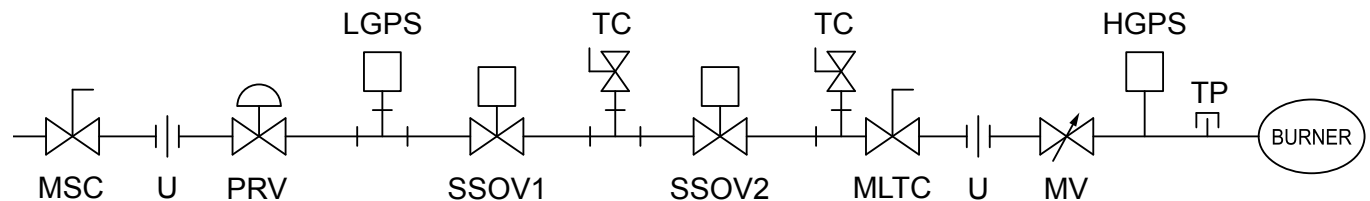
UL Gas Train: Lo/Hi/Off or Lo/Hi/Lo, CG15 & CG25 (1 million to 2.5 million BTU)
